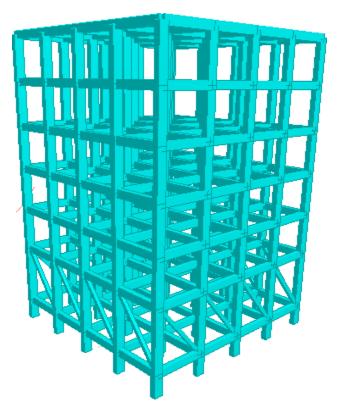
10 3D View Of Ground Floor Soft Storey With InclinedColumn Render View
